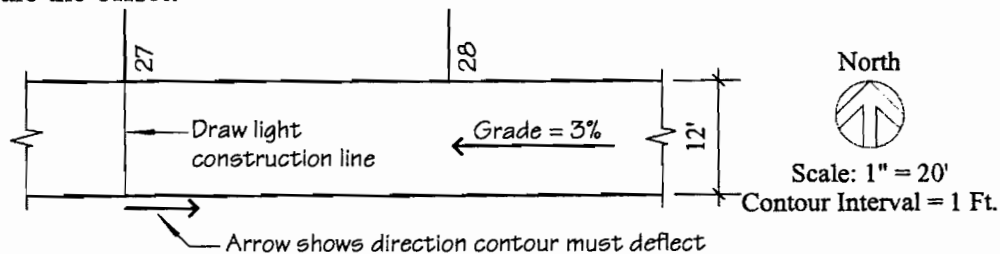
Drawing a Construction Line From a Point of Known Elevation
